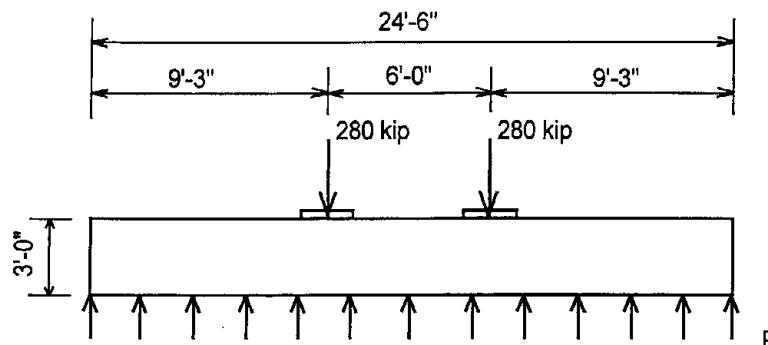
Assumed loads from load frame to load frame footing (1' = 305 mm, 1" = 25.4 mm)
